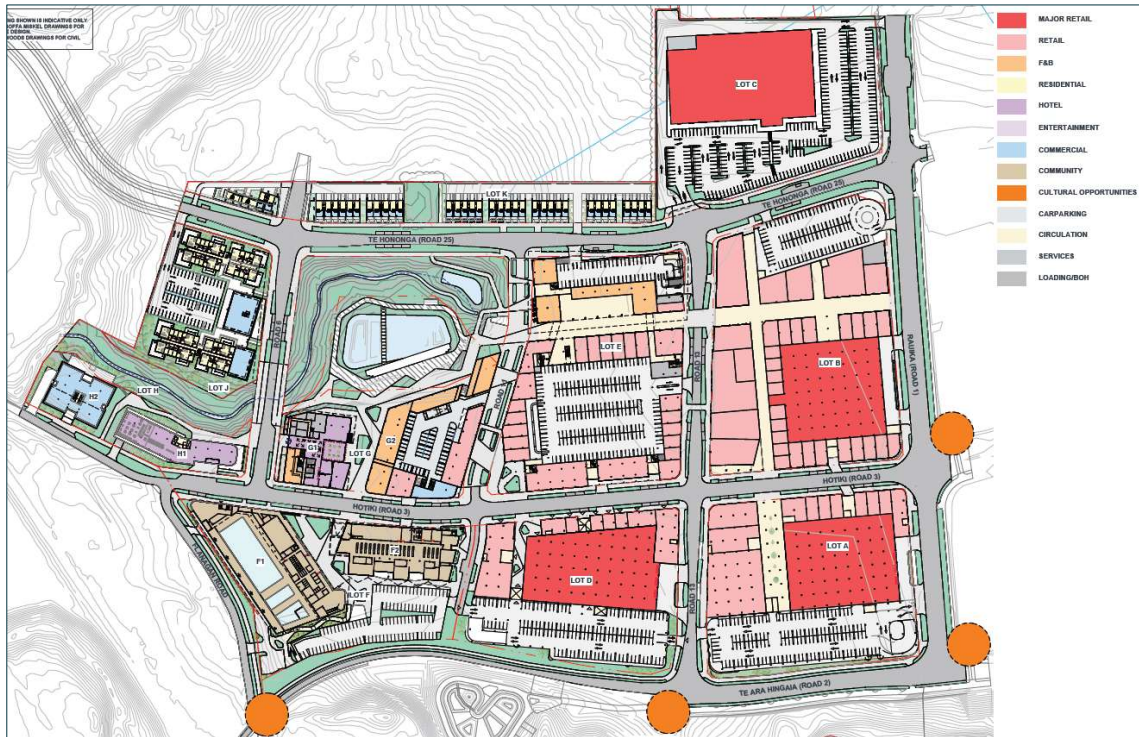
Drury Centre Stage 2 Masterplan (Source: Ignite Architects, 14/02/2025)
